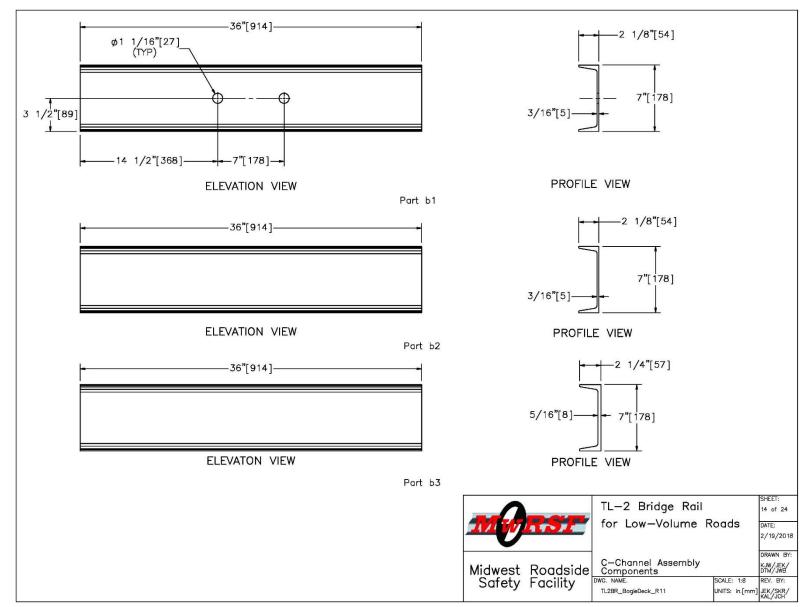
Bogie Testing Matrix and Setup, C-Channel Assembly Components
